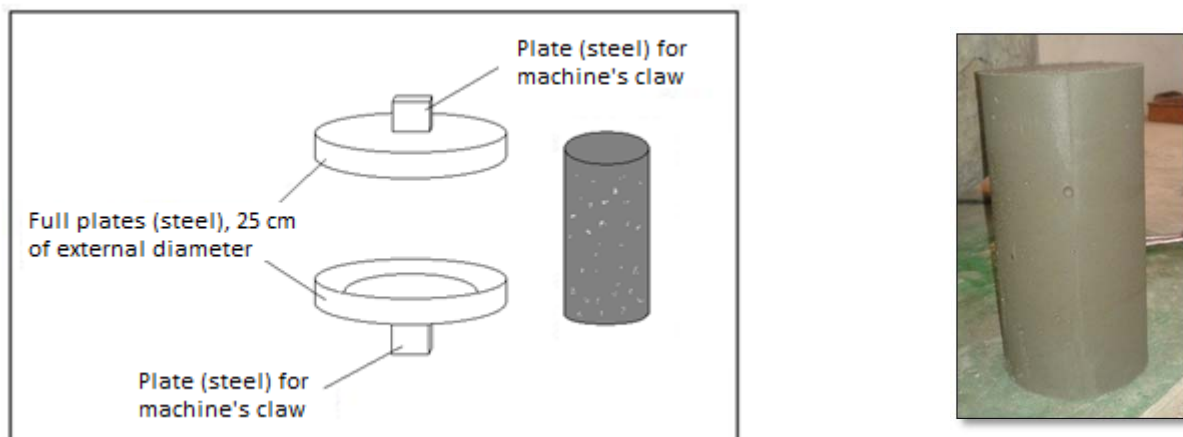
Mechanism to support the fatigue test and compression test specimen.
